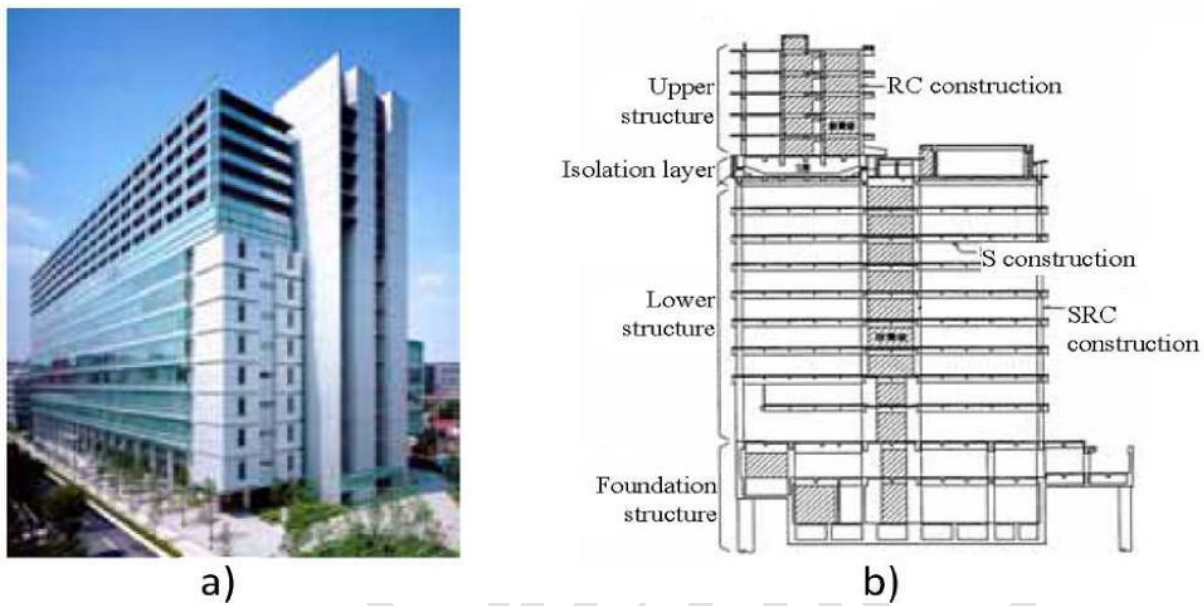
“Idabashi First Building, First Hills Idabashi”, Japan; middle story isolated system : external view, b) structure elevation
